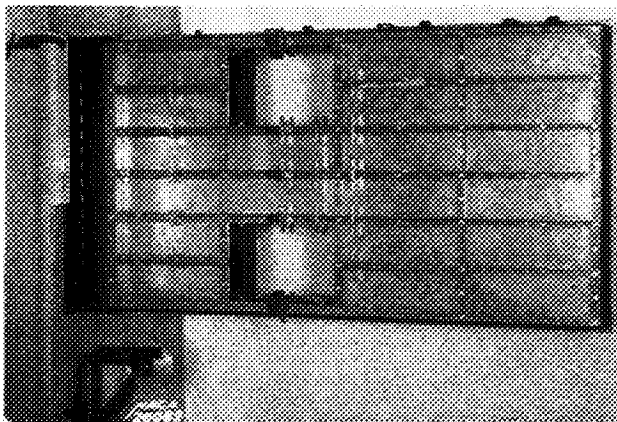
Test set-up for beam 1 with cut-outs.
